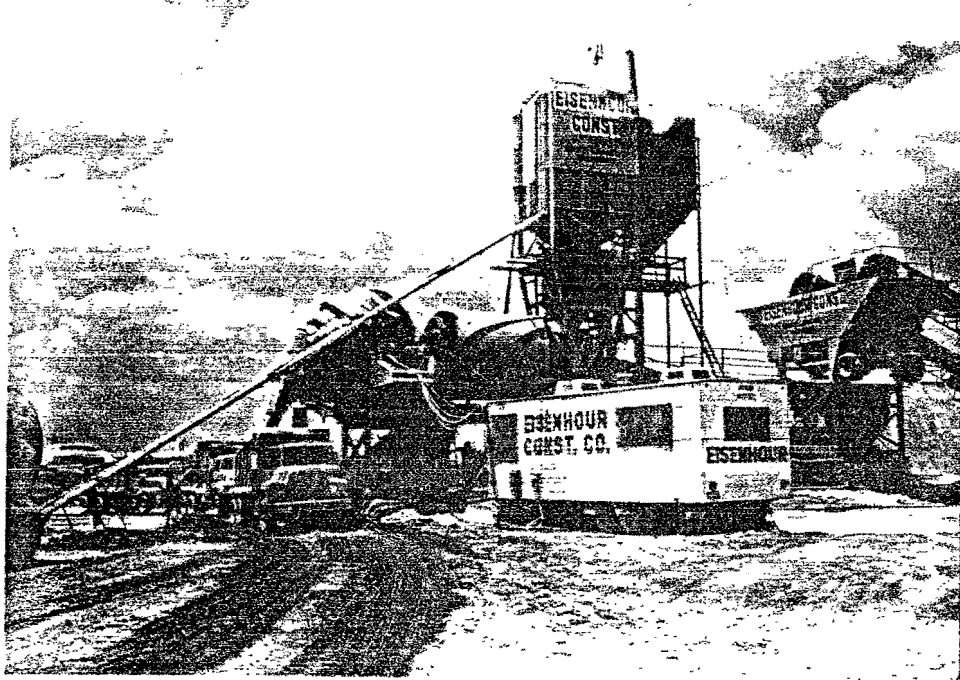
Twelve cu.yd. Concrete Batch Plant on IH 27, Hale Co., (Test Site 9).
